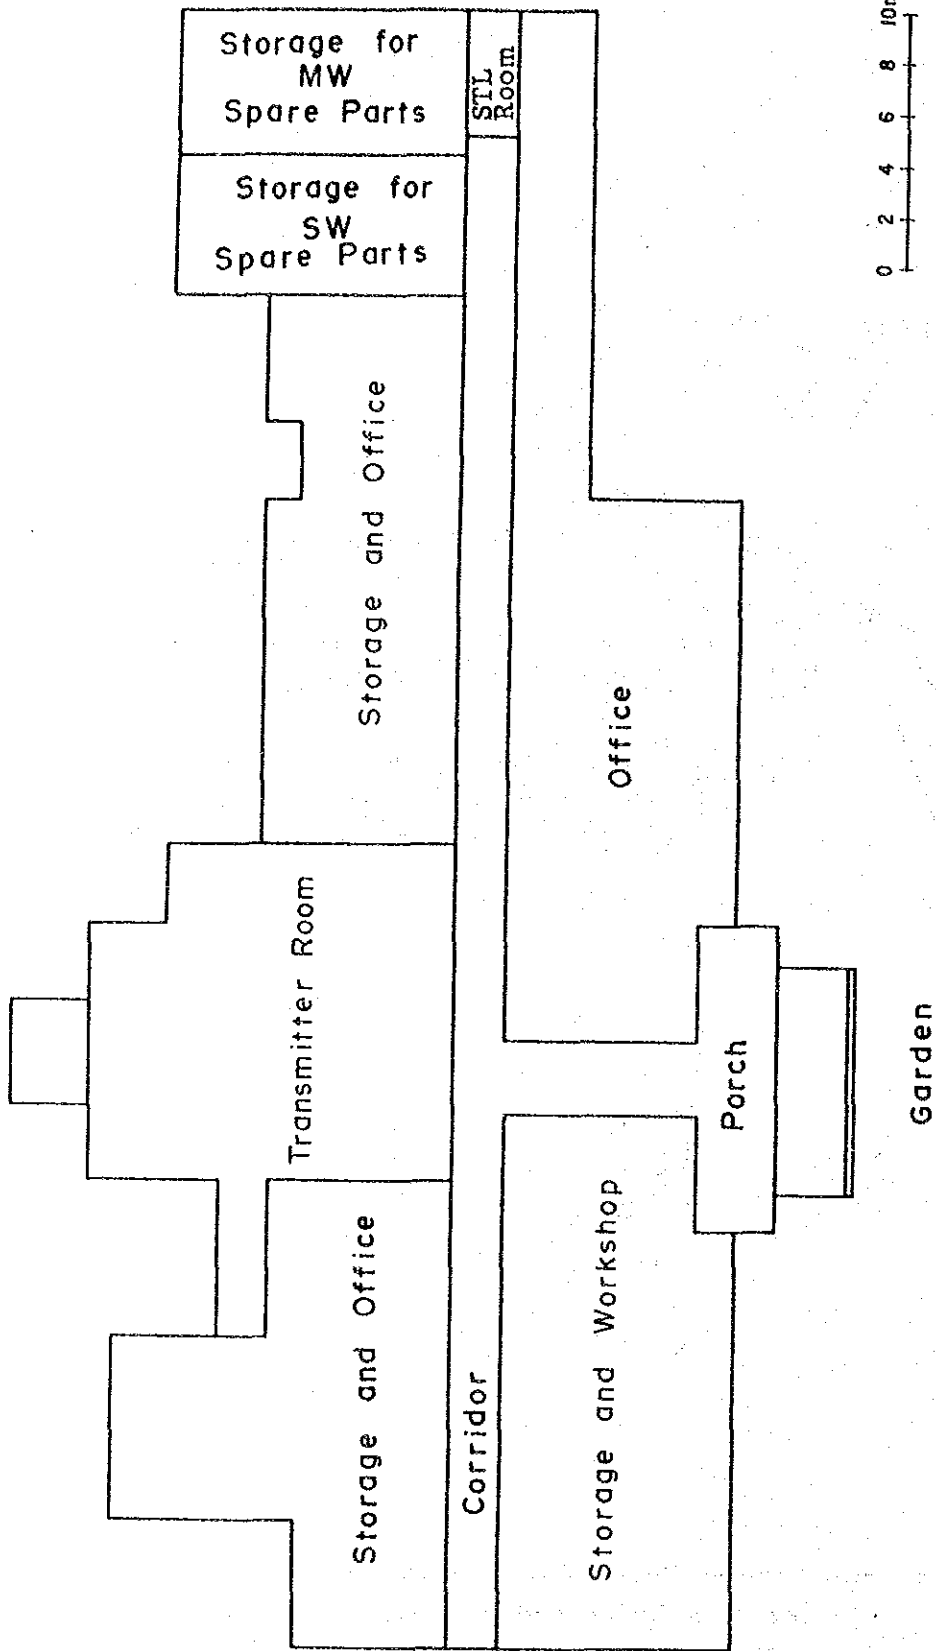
Floor Layout of Savar Transmitting Station (Existing)
